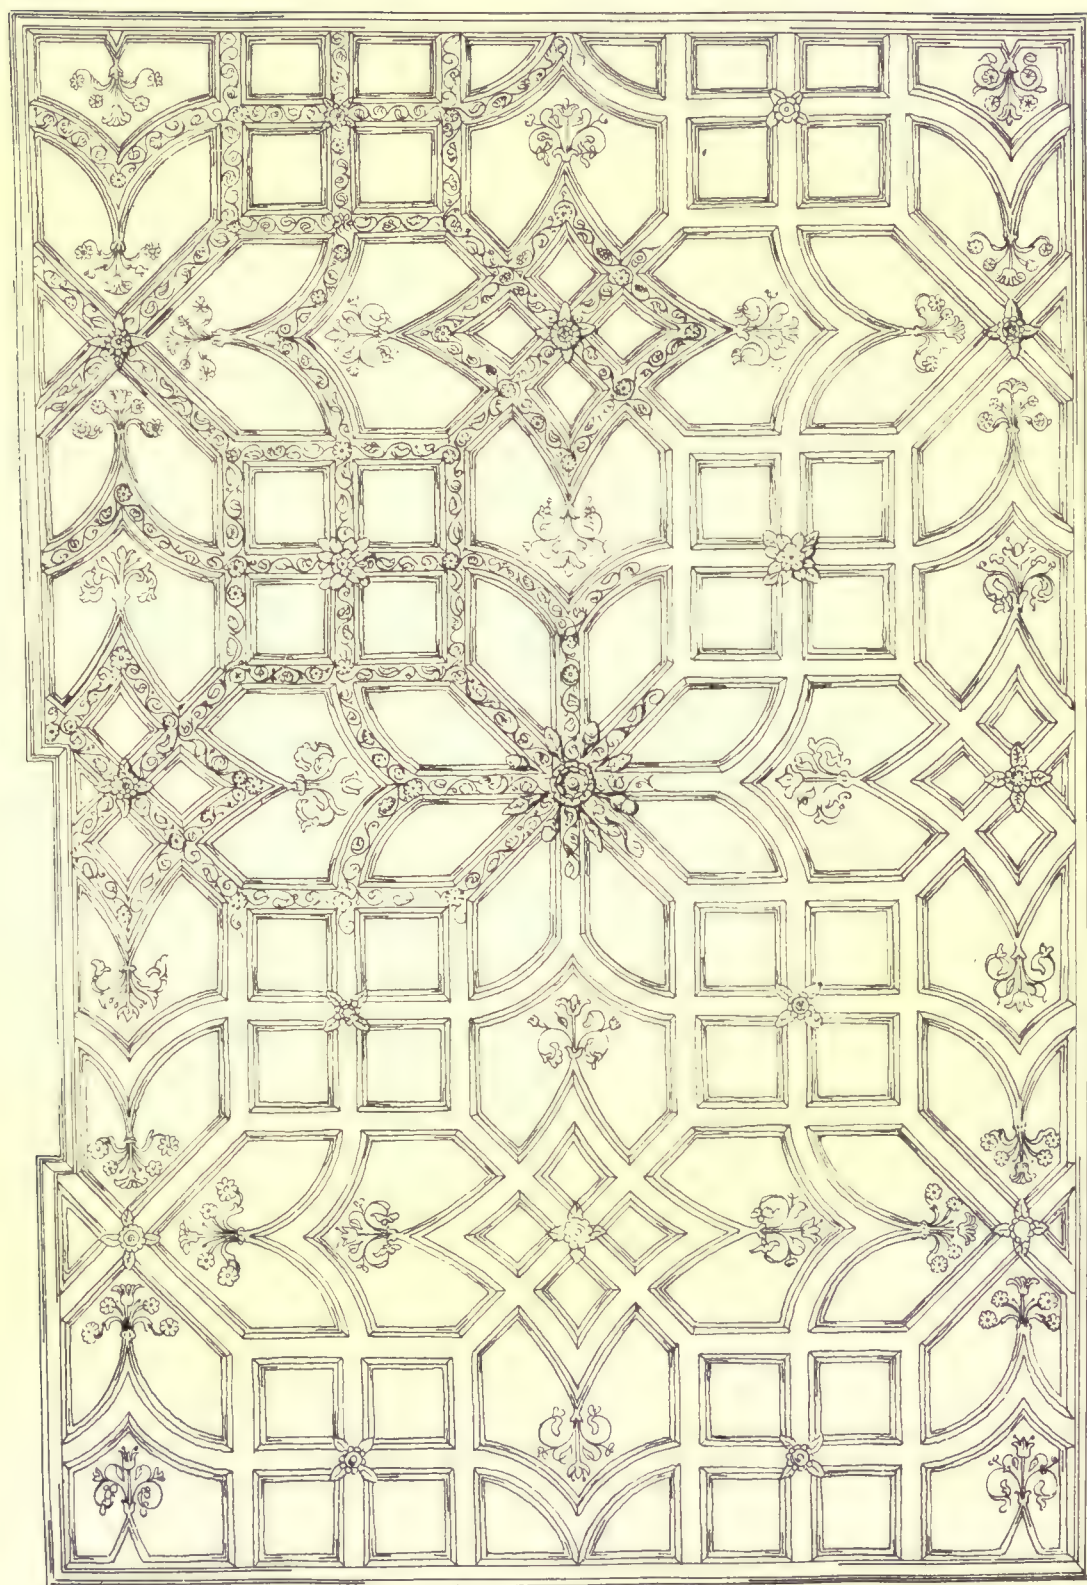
PLAN OF CEILING, BAMPFYLDE HOUSE, EXETER.
